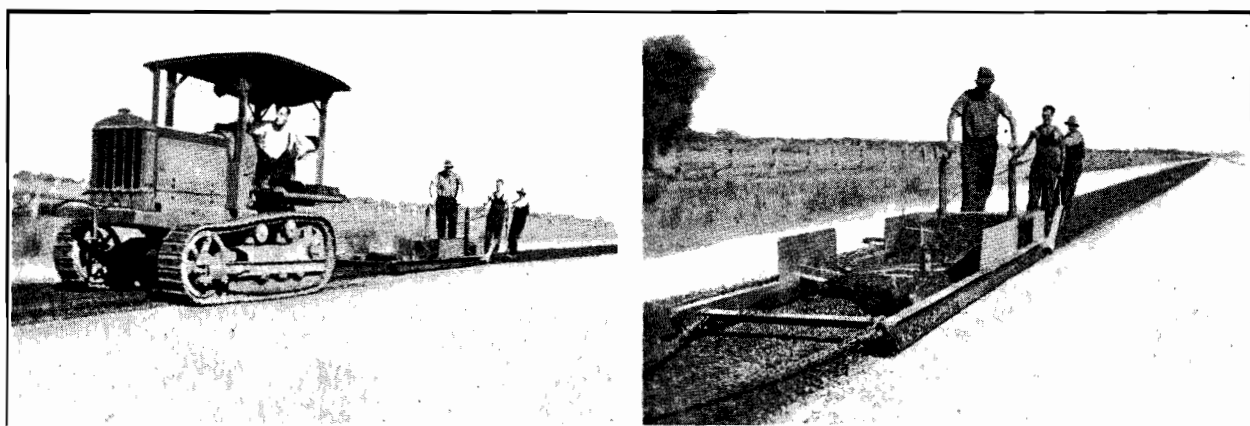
and 17.—Rolling mixed material on half of finished pavement on the Hume Highway at Bowser.
